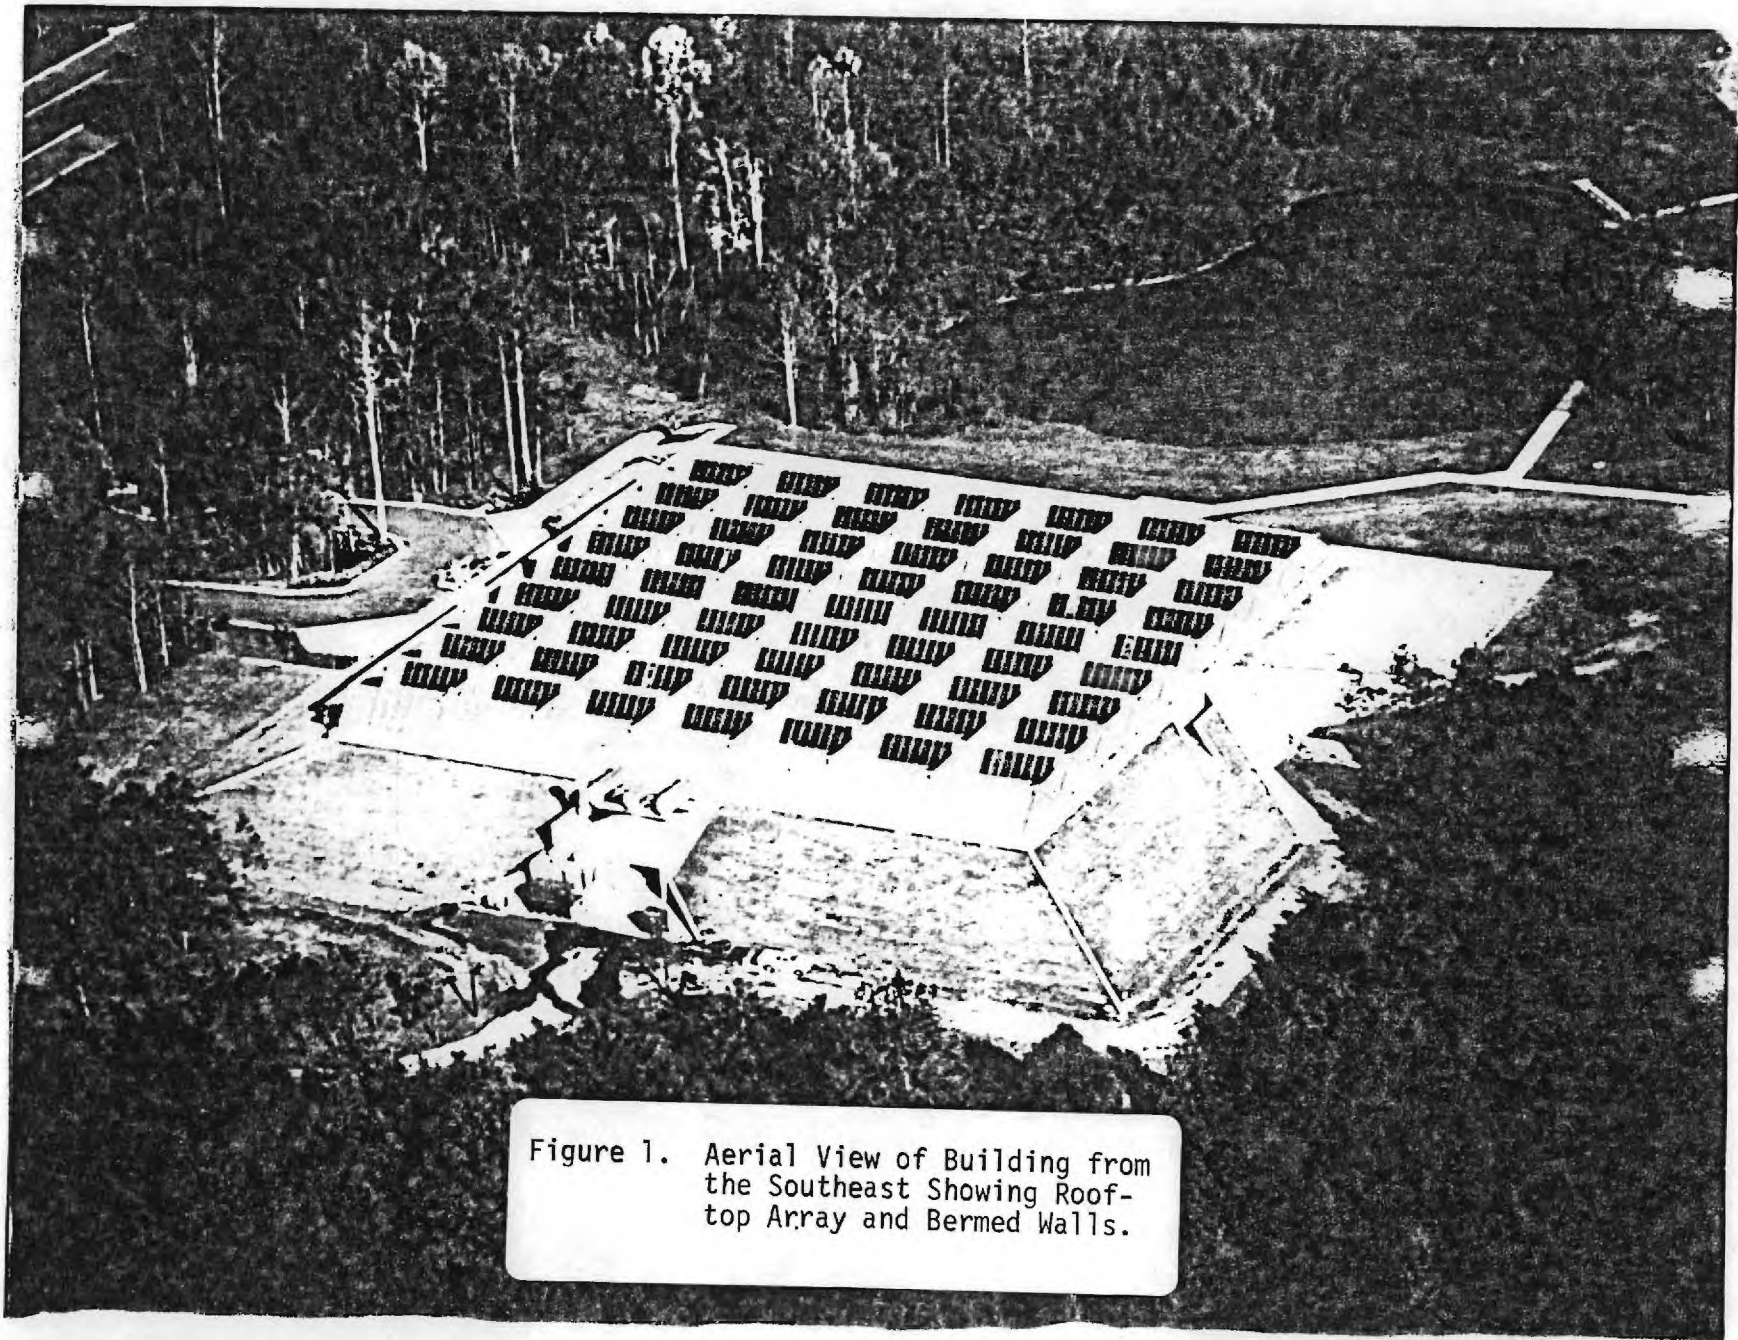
Aerial View of Building from the Southeast Showing Rooftop Array and Bermed Walls.
